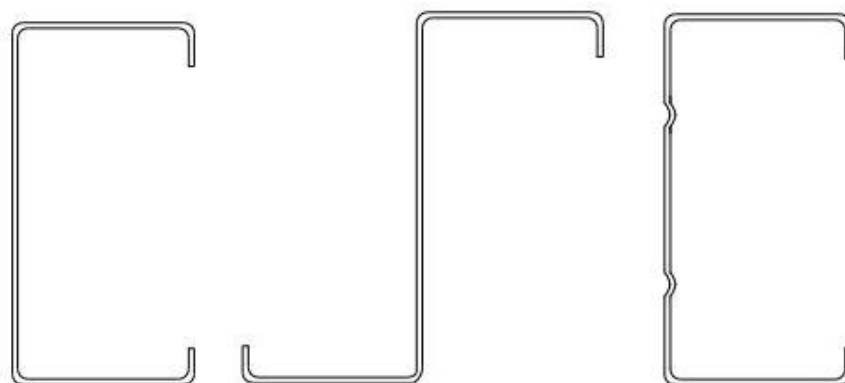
Typical popular cross-sectional shapes of cold-formed steel members
